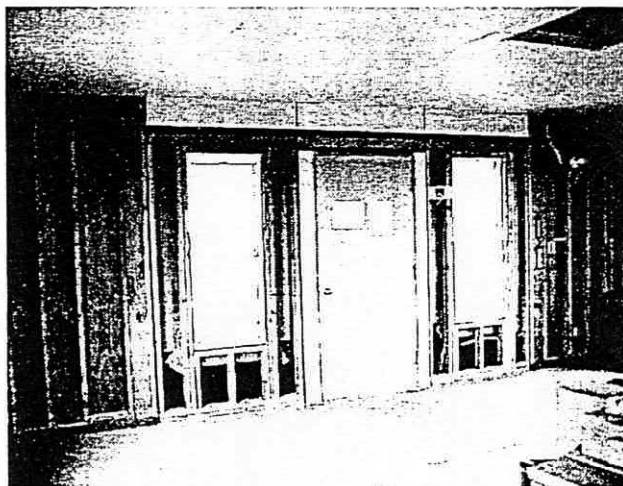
~ Interior walls were built with 2- by 6-inch studs, using 12-inch on-center spacing, allowing for easy installation of the test boards.
